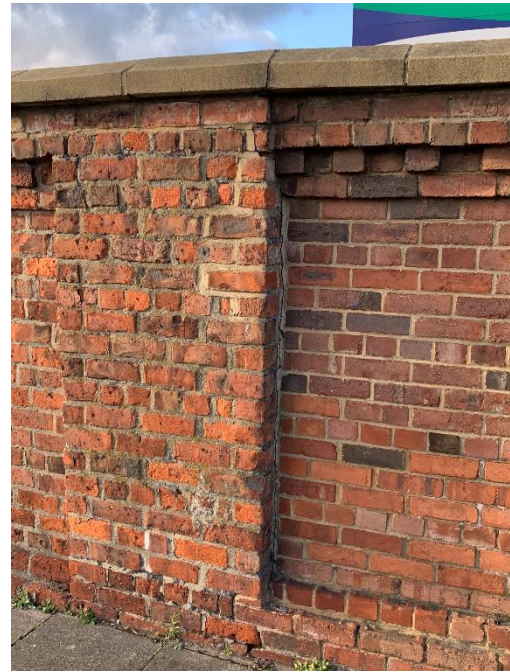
Wall Section 4, top section of wall has been re-built with brickwork to try and match the original brick.
